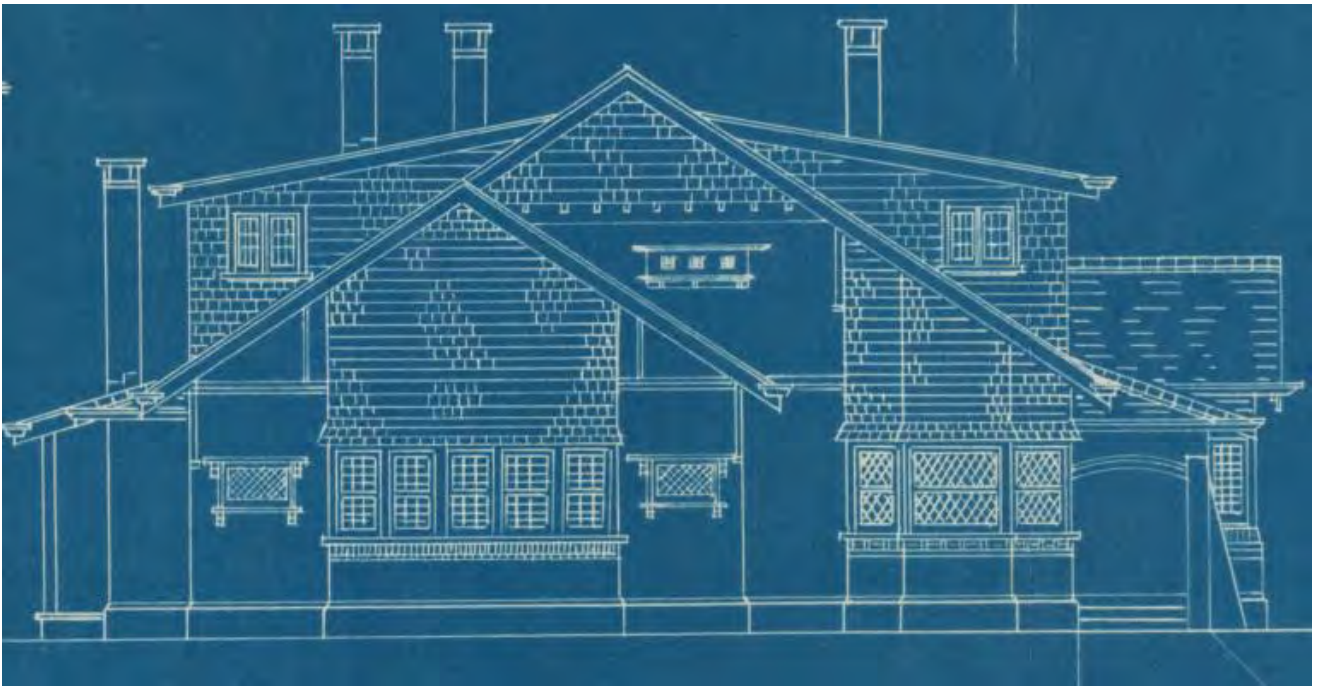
Plan of villa residence for E. Shephard Esq, Normandy Road, St. Kilda (south elevation).
